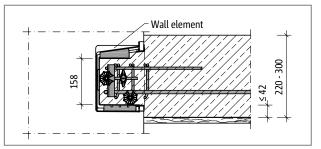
Schöck Tronsole® type Z: Wall element as stay-in-place formwork; underside of the landing lower than the connection frame of the wall element
